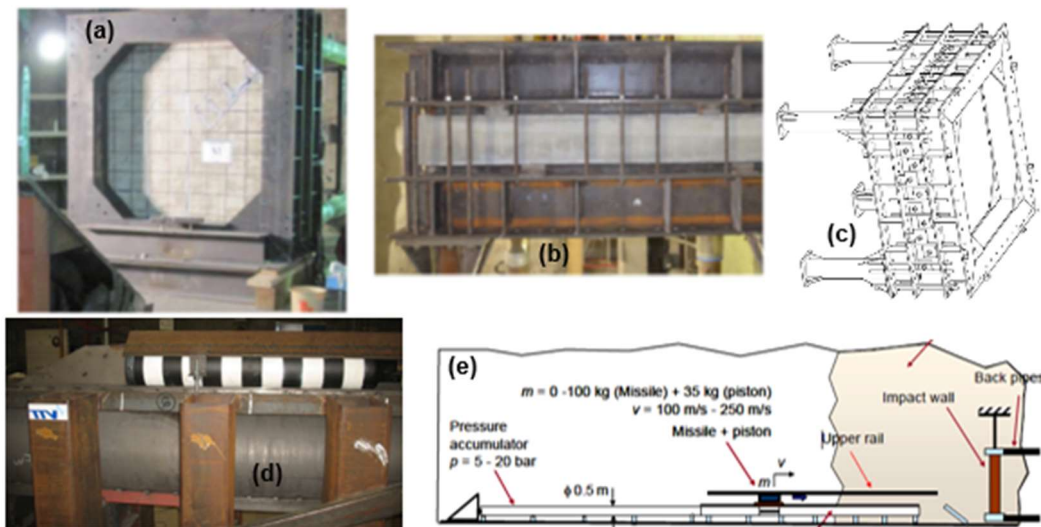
the experiment installation, (a) RC wall; (b) tightened screws; (c) supporting structure; (d & e) projectile setup
